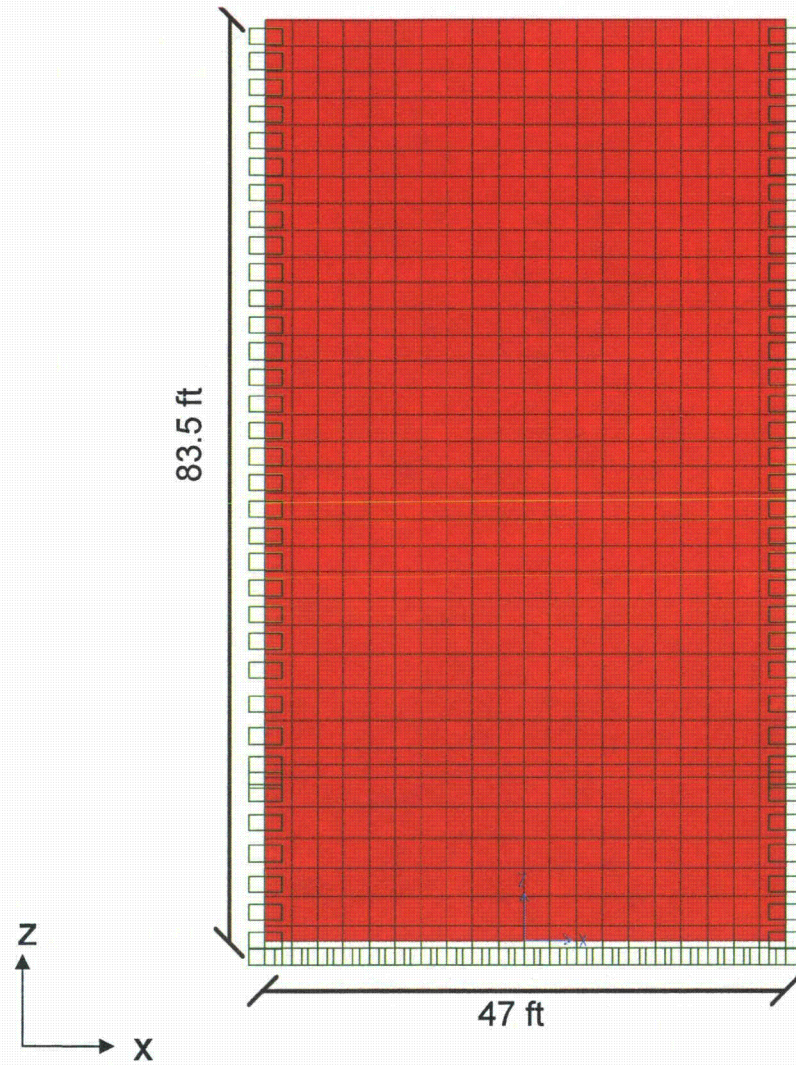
S1.185: Typical Wall Panel of UHS Basin Modeled in SAP2000
